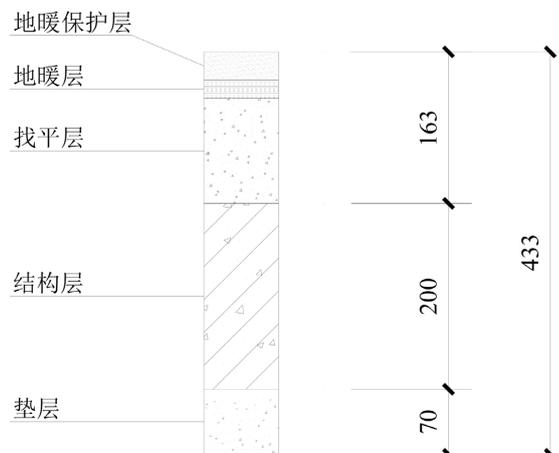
Composition section of floor slab in the area of grid lines 7-9/B-C
